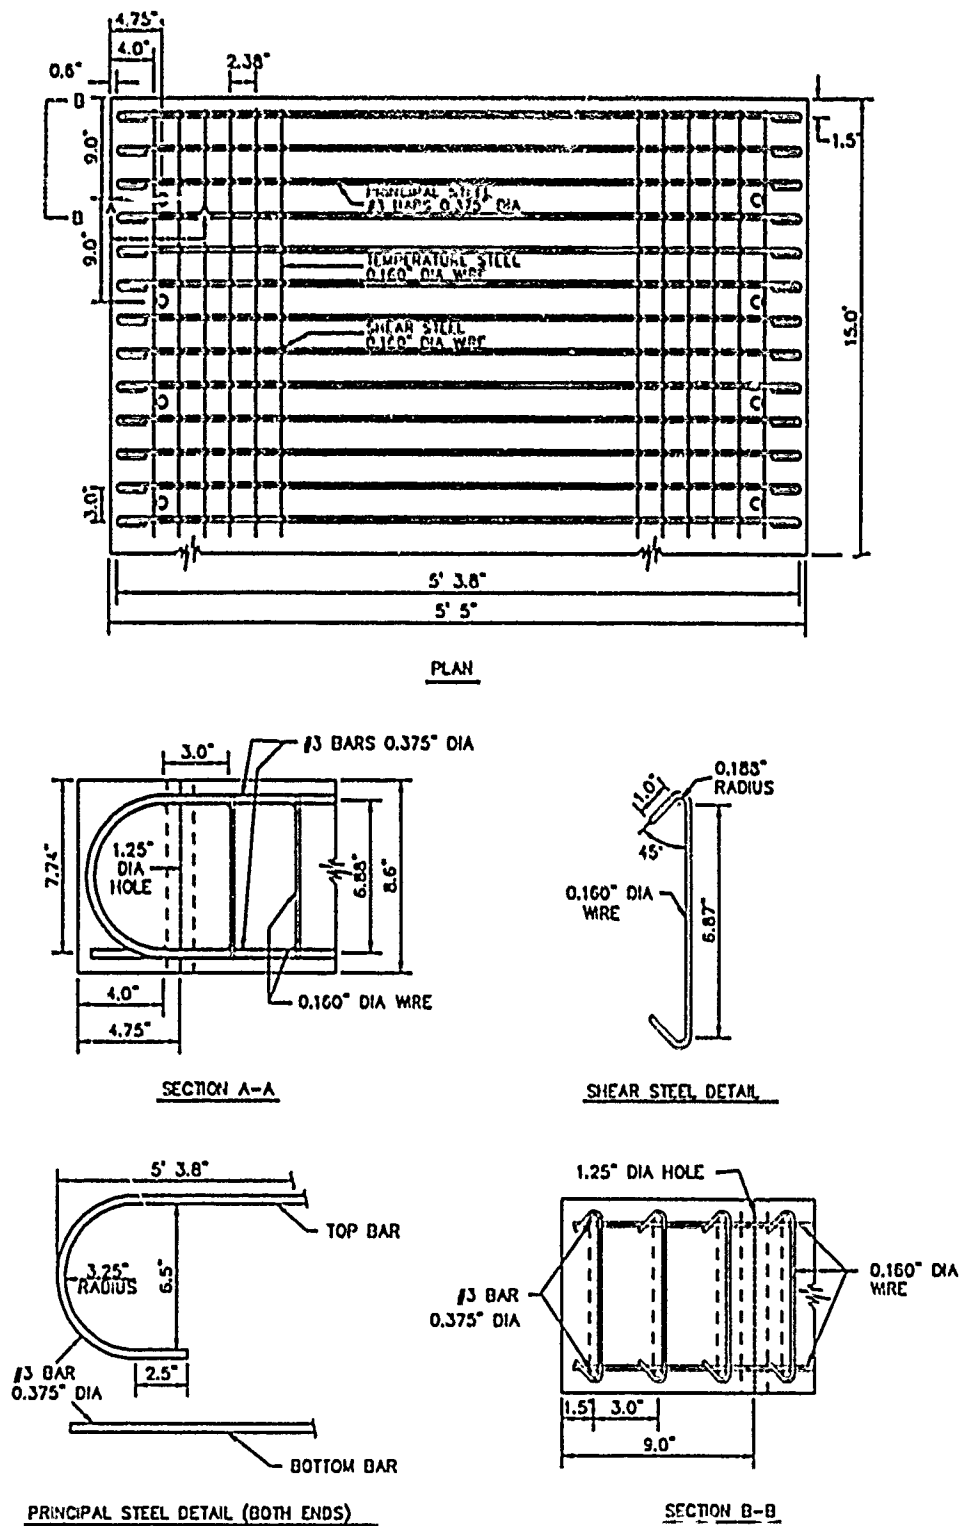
Reinforcing steel layout for test slab with L/t of 5.
